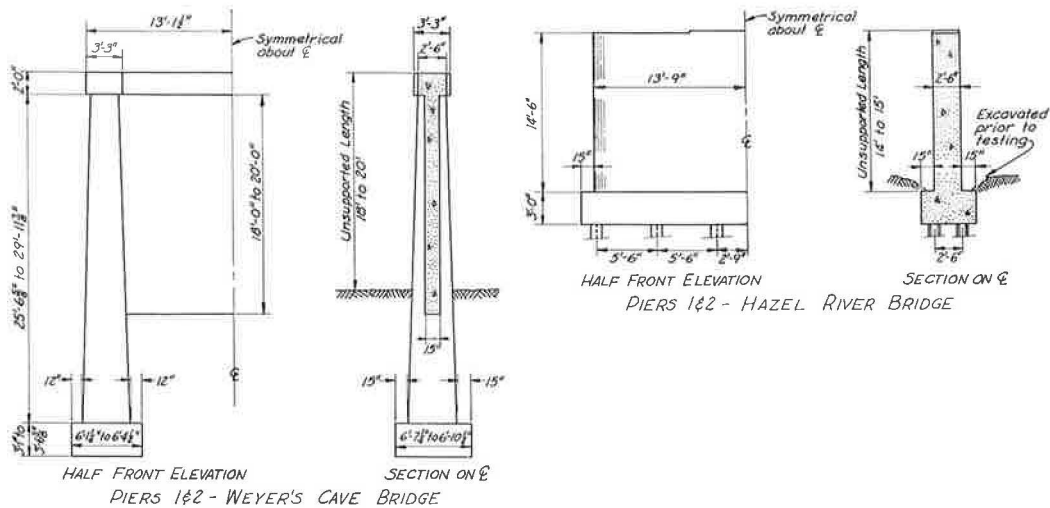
Details of pier supporting two 66-ft 5-in. spans B of Weyer's Cave Bridge and Hazel River Bridges.
